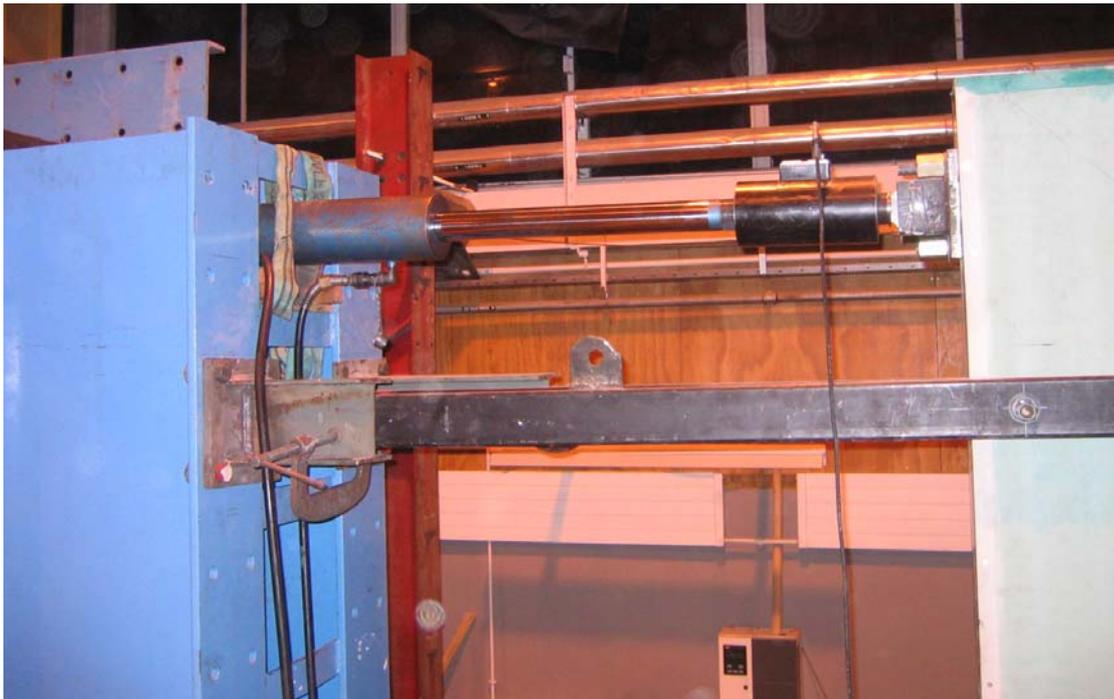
Connection of the load cell and hydraulic actuator to the AFS150 wall unit
